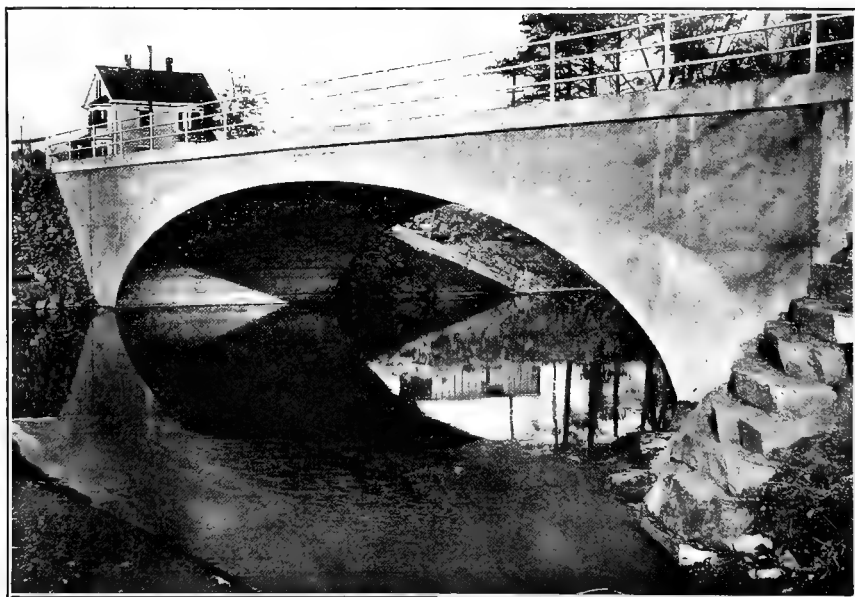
ARCH BRIDGE WITH SPAN OF 75 FEET, ELM STREET, CONCORD, MASS.
